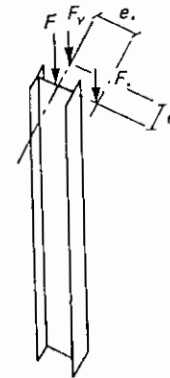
Loading on a beam column in 'simply designed' frame.
